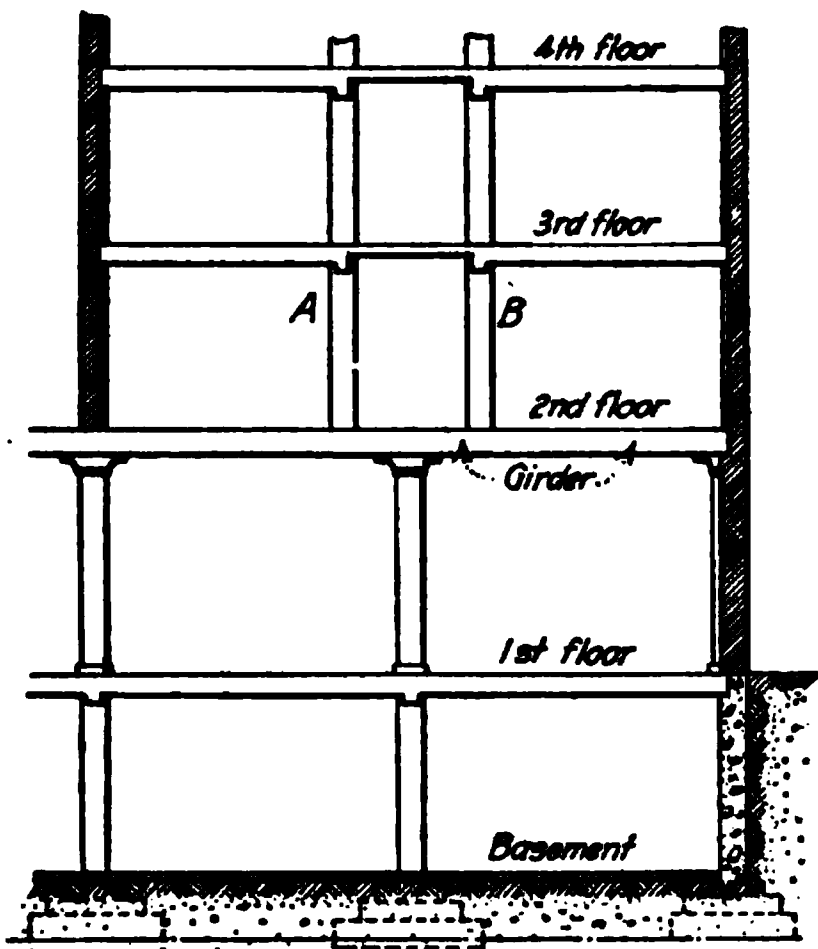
Part sectional elevation showing twin columns above and single columns below.
